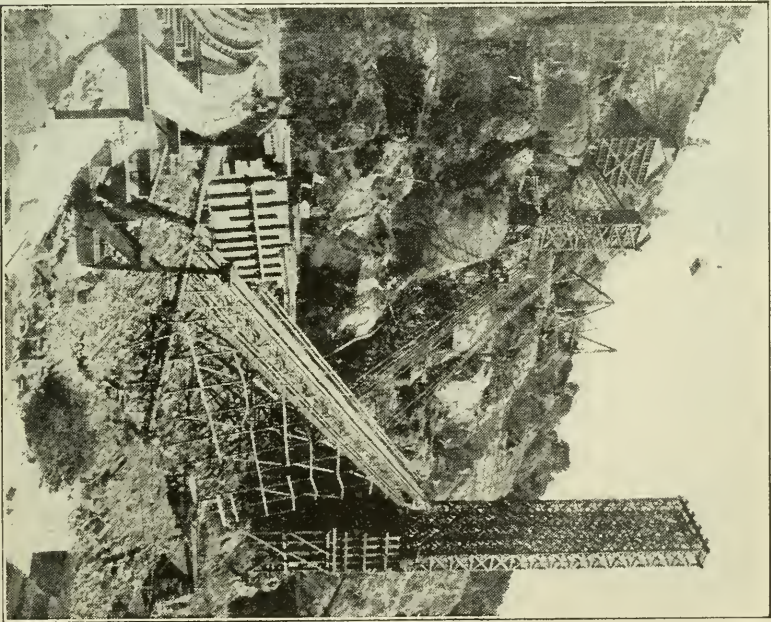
CONCRETE PLANT, HETCH HETCHY DAM CONSTRUCTION.
